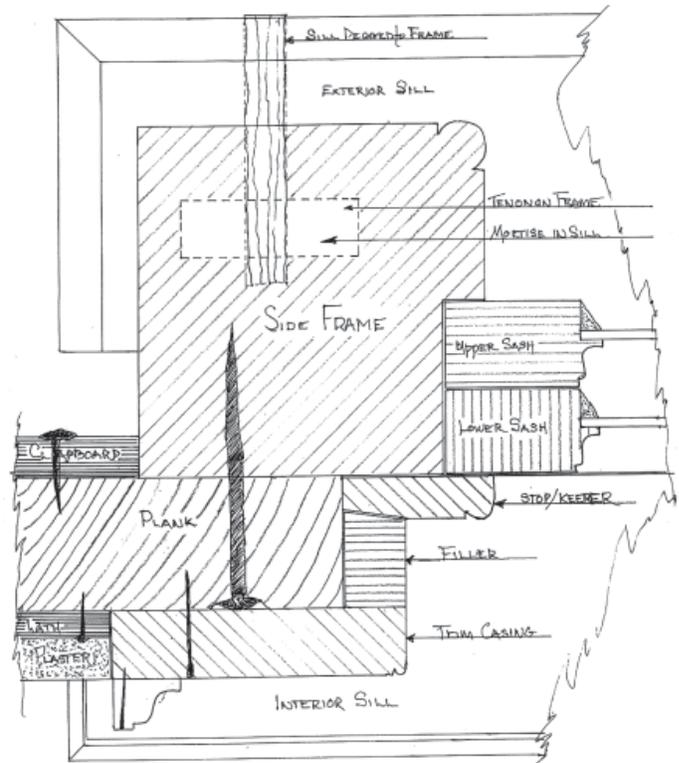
This is a cross section of an interior/exterior window frame with a section of plank wall showing where and how the frame attaches to the building.
